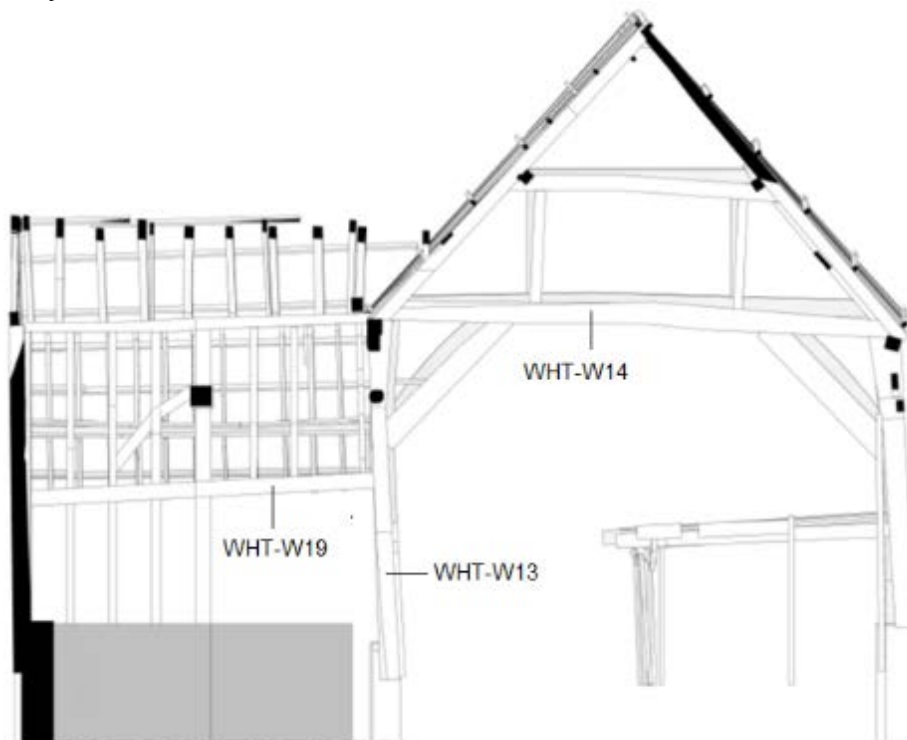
Section through Truss 4, east face, showing the sampled timbers, WHT-W13-14, and WHT-W19 (after ATD London Ltd)
